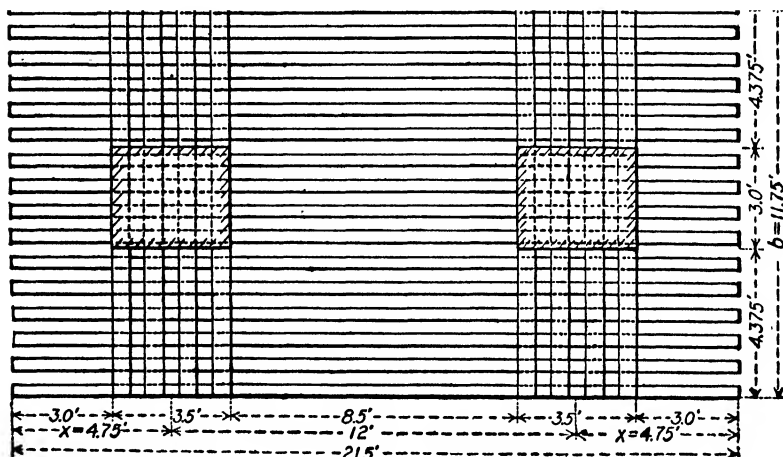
Double-column Footing of Steel I-beams.
